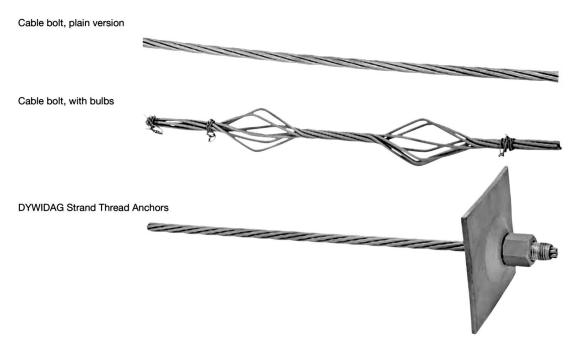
Typical cable bolts (DYWIDAG company material)
